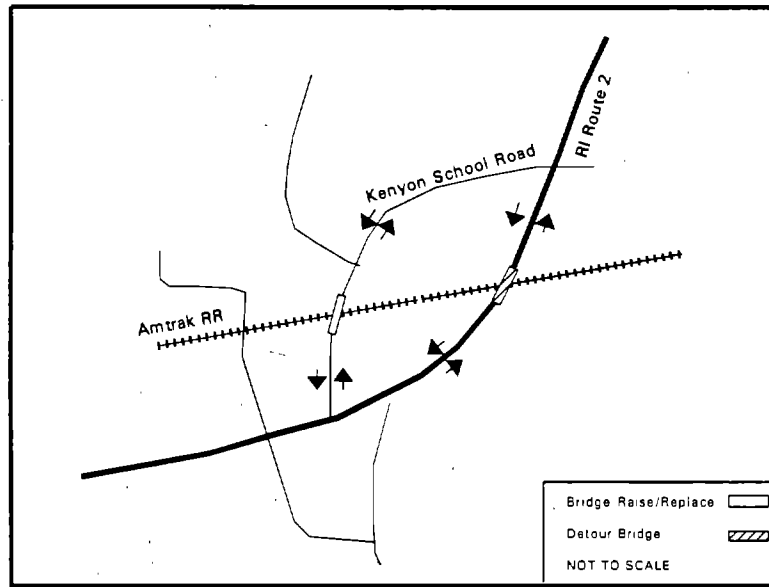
KENYON SCHOOL ROAD DETOUR
